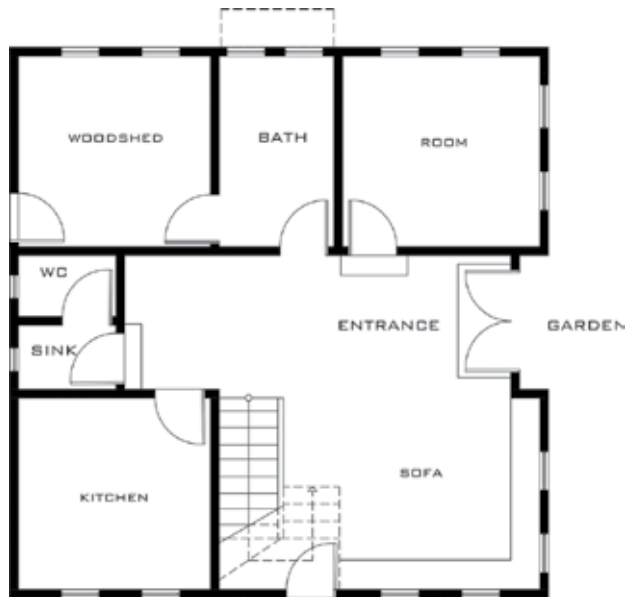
Upper floor plan of Hatice Tuzcu house.
